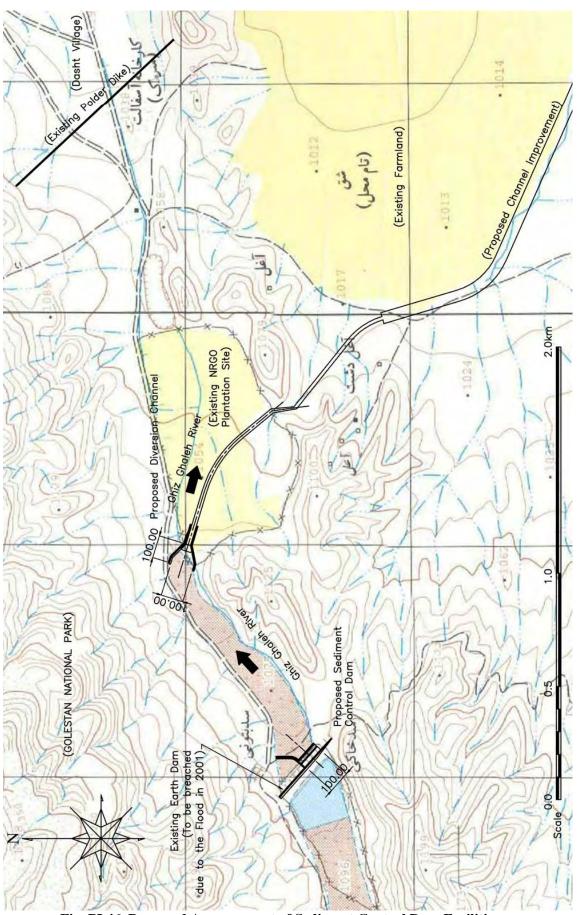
Proposed Arrangement of Sediment Control Dam Facilities
